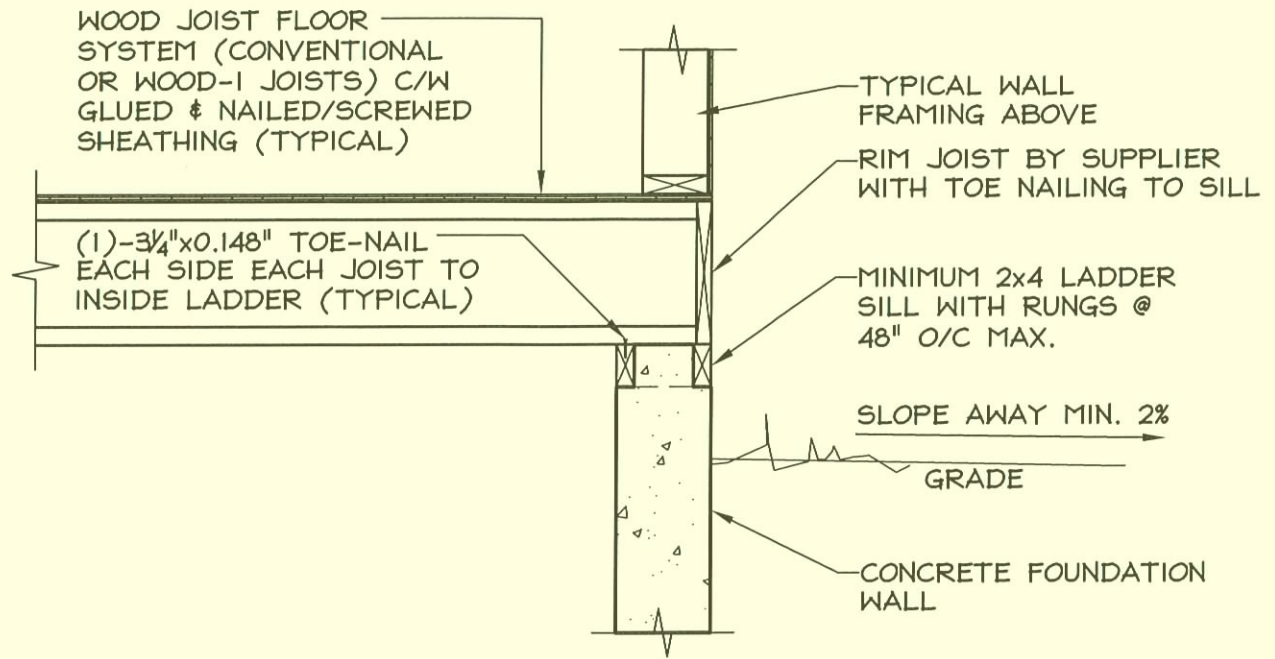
Lateral Connection TYPE 1 (Joists Perpendicular)
